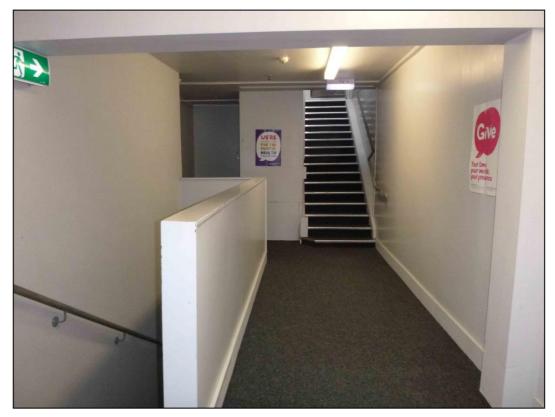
Mezzanine landing (Room 6) at Peters' Building, looking north.
